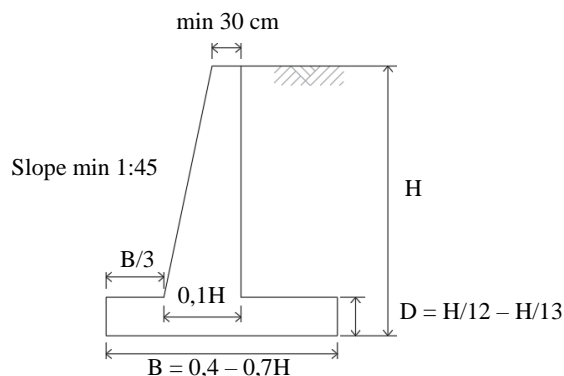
Dimensional Design of Cantilever Type Retaining Walls
